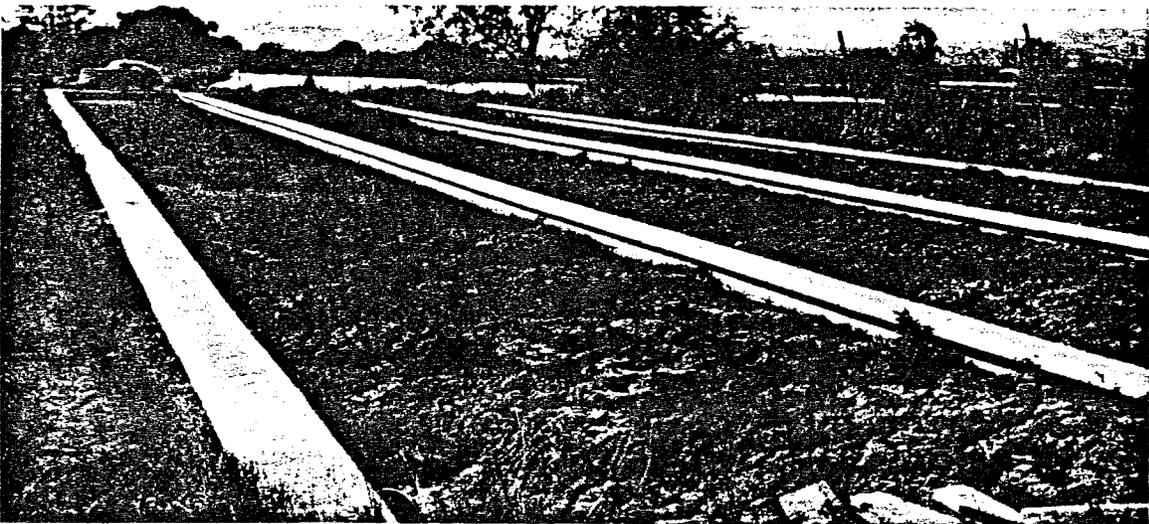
Santa Rosa Sewer Farm showing concrete settling tanks with crust.
